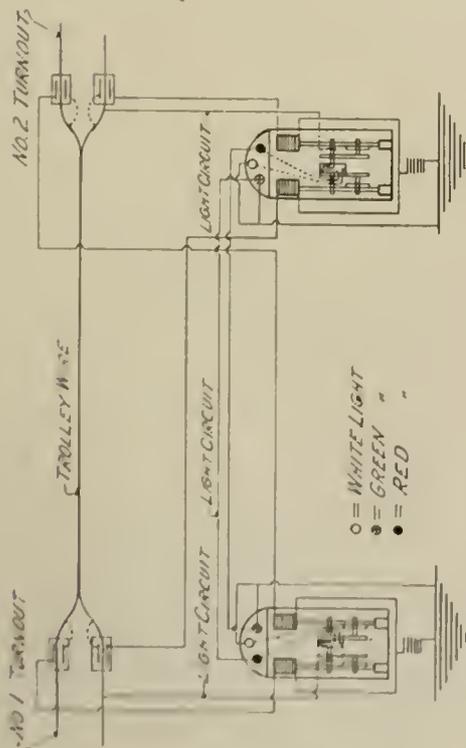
WIRING FOR SINGLE TRACK ROAD.
